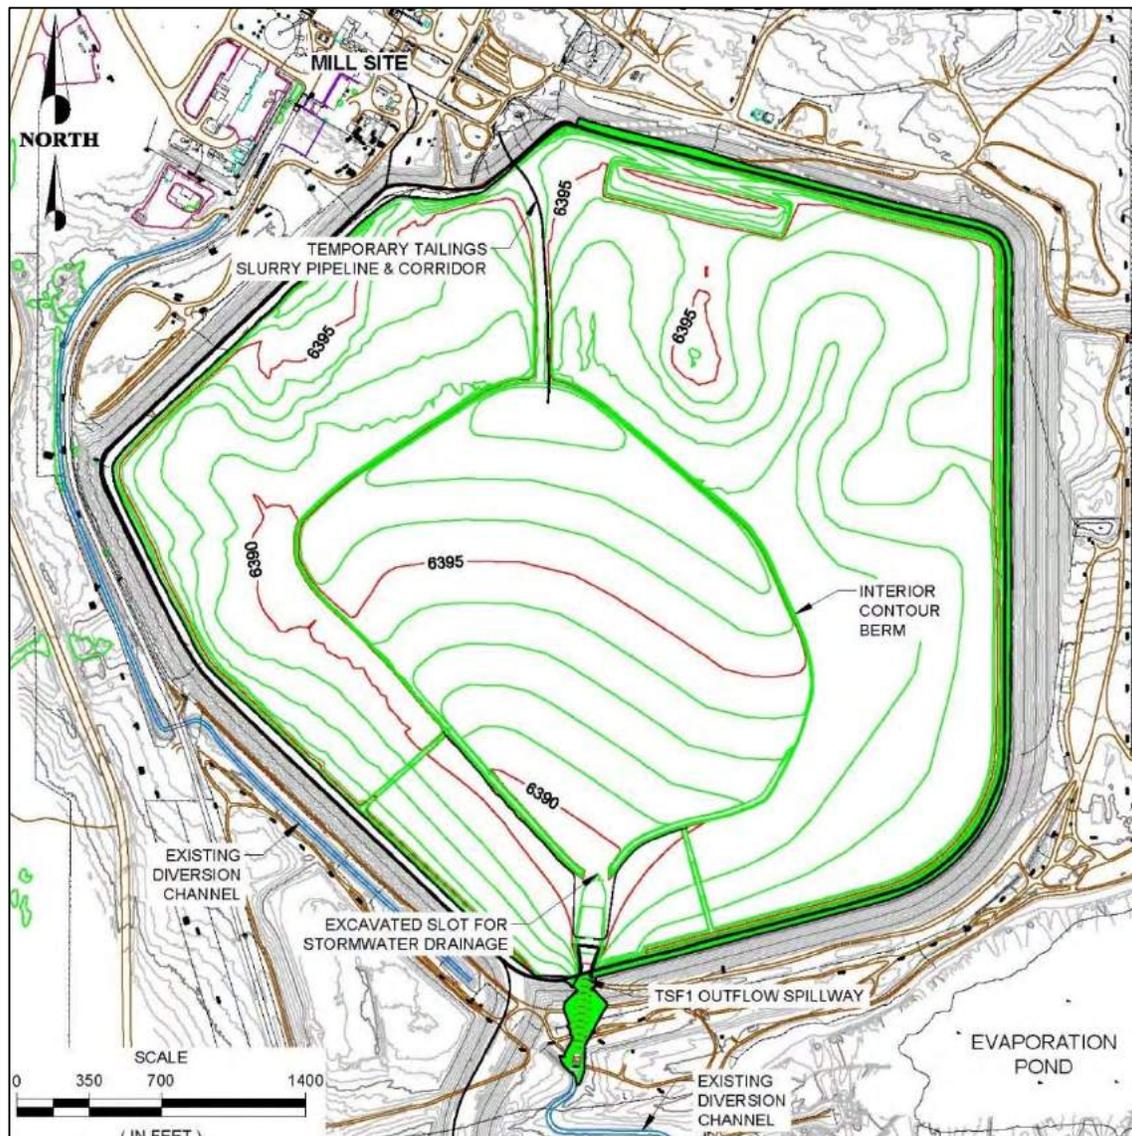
TSF 1 IWP Final Grading & Spillway Design.
